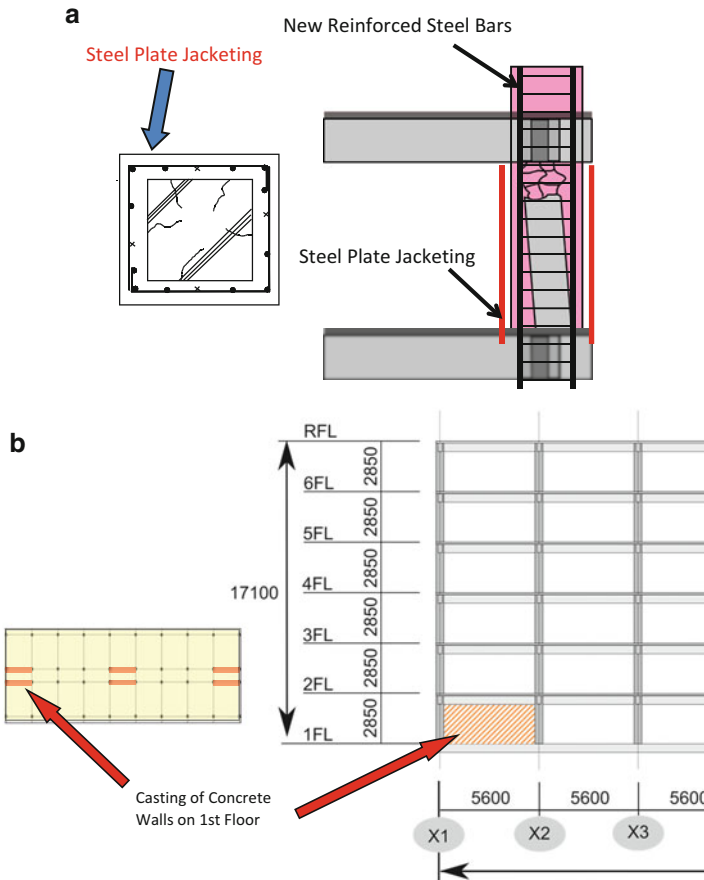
Proposal of restoration methods for damaged concrete buildings. (a) Steel plate jacking of concrete column. (b) Casting of earthquake-resistant concrete wall
